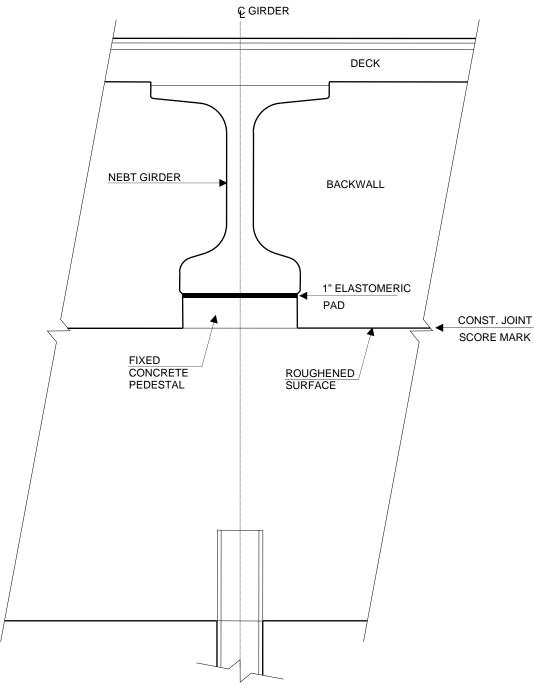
Bearing Assembly Cross Section (NEBT Girder)
